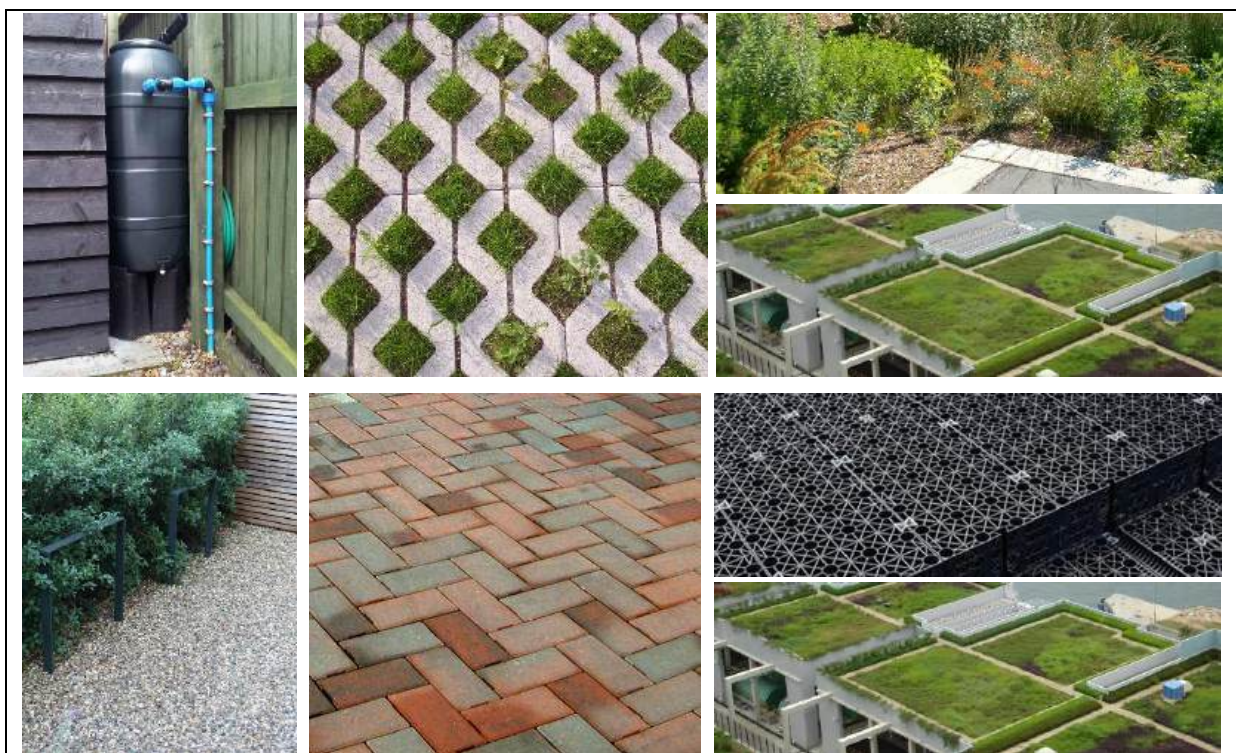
Surface water storage facilities and potential SuDS features - rainwater harvesting, on-site tank storage, rain garden soak-away and green roofs. (Source: UK SuDS Manual)
